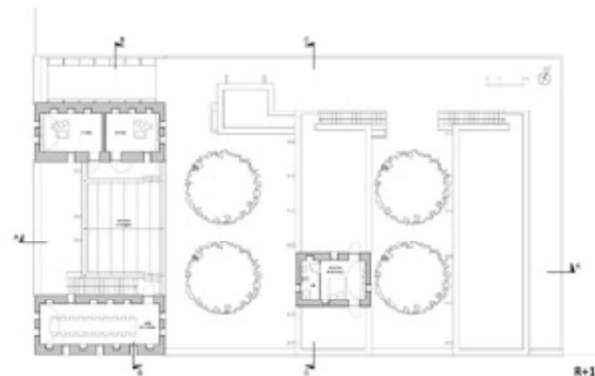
Floor plan of the second floor (©AI-Mizan Architecture)
